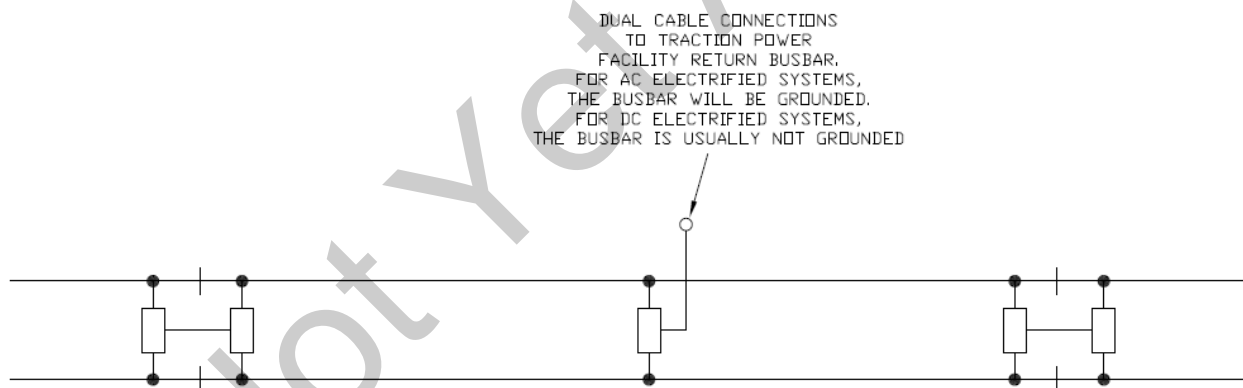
Substation Drain Bond on Signaled Single Track Railway (2011)
